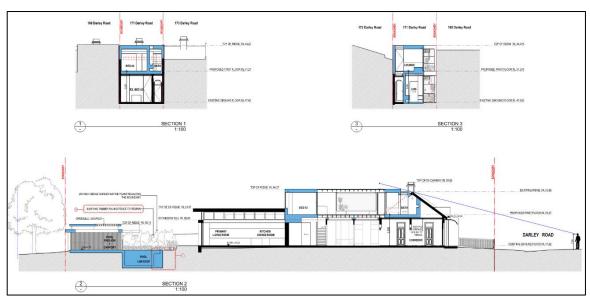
Extract of proposed Section Plans (Source: Ahron Best Architects).
